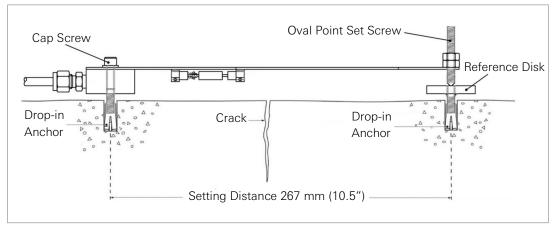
Assembly Using Reference Disk and Two Anchors
